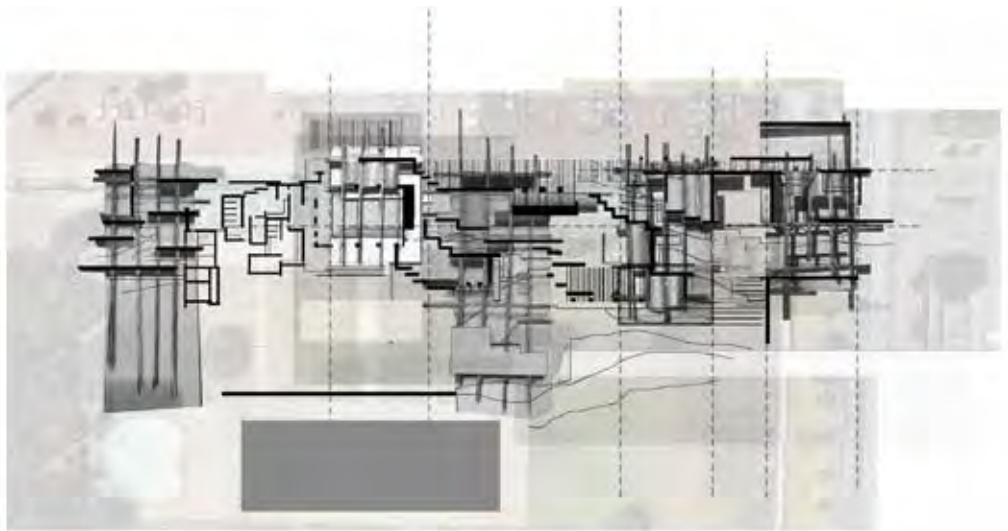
Architectural model showing diagonal circulation, structural gutters, sloped ground and retaining walls
